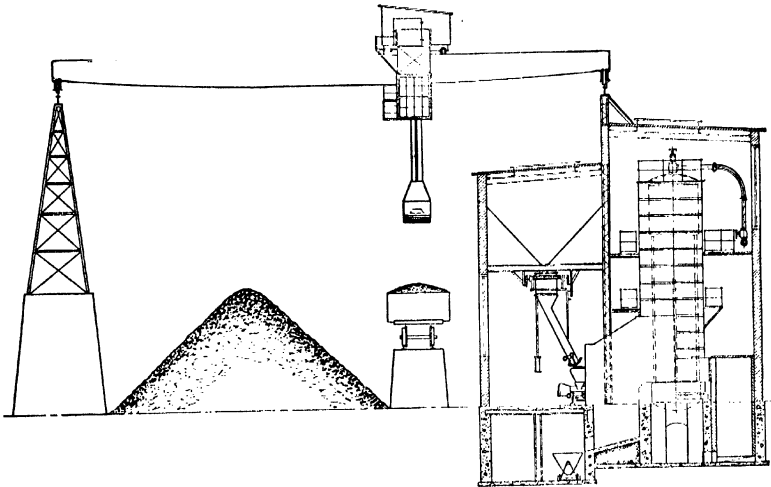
Coaling Wickes Boiler House with Overhead Electric Traveling Crane.
